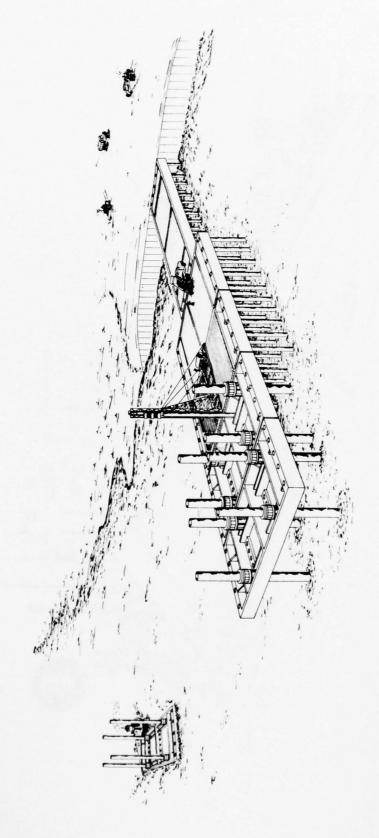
Artist's concept of concrete pier module installation (from Reference 52)
